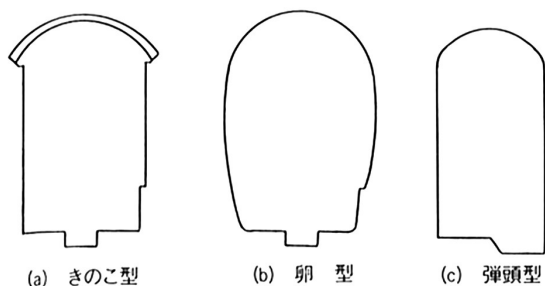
Shapes of cross section for large cavern represented by underground electric power plants
